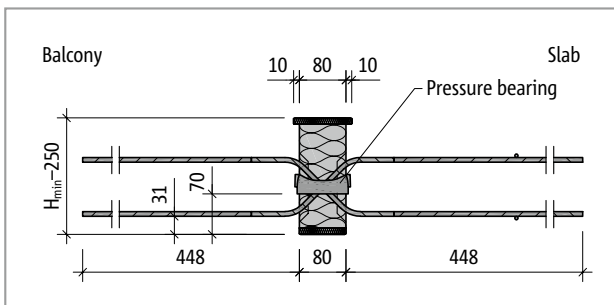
Schöck Isokorb® T type Q-VV6: Product section
